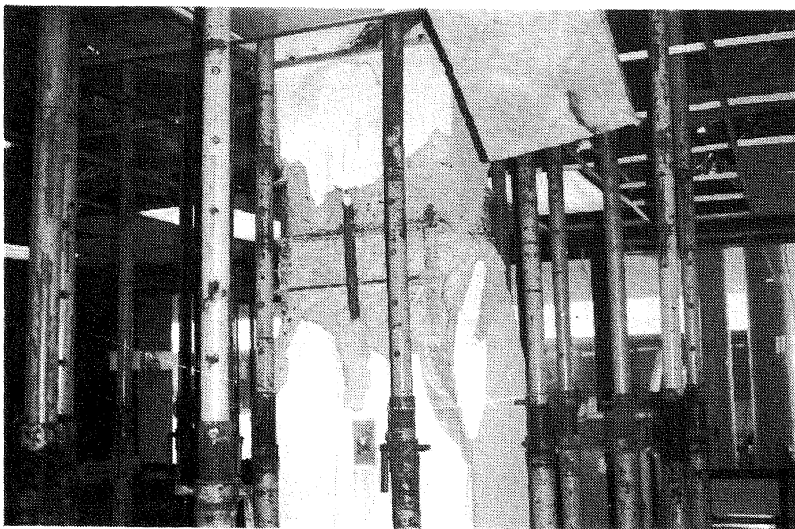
NPC Building, Quezon City, 3rd level; shear failure of column at mid height construction joint
